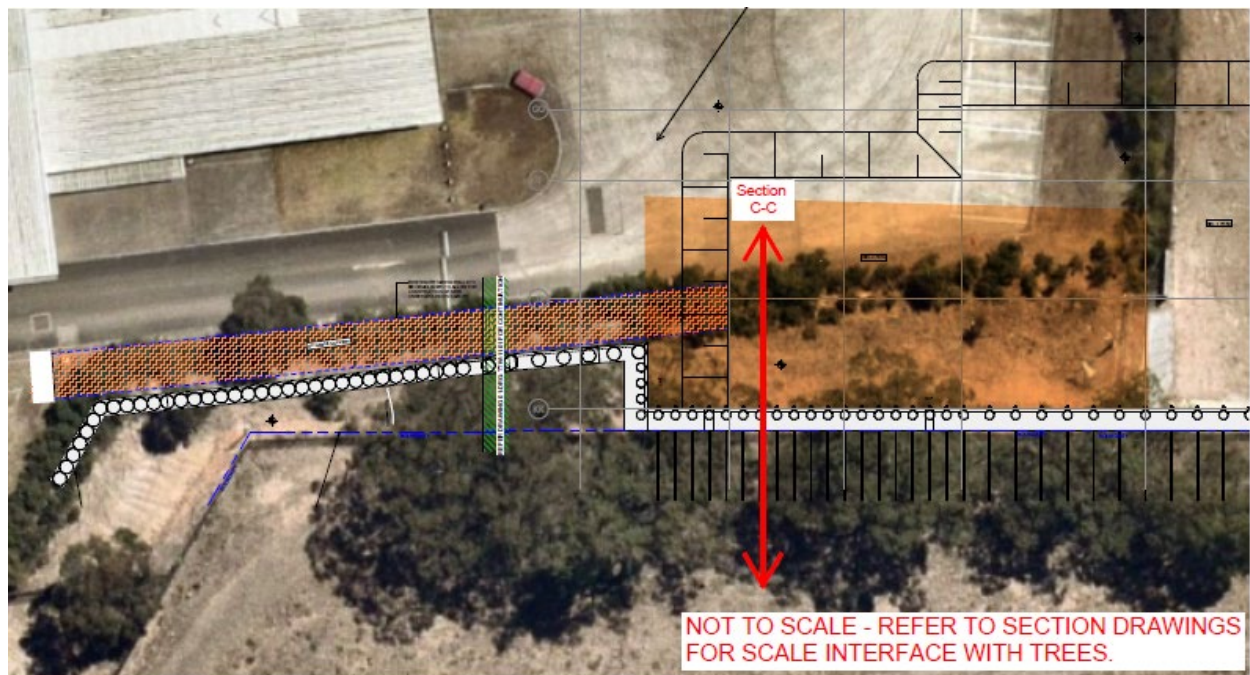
Preliminary section plan showing location of piling, retaining wall and excavation inside the study area and rock anchor and soil nails in the heritage curtilage (DEM/TTW 2026)
